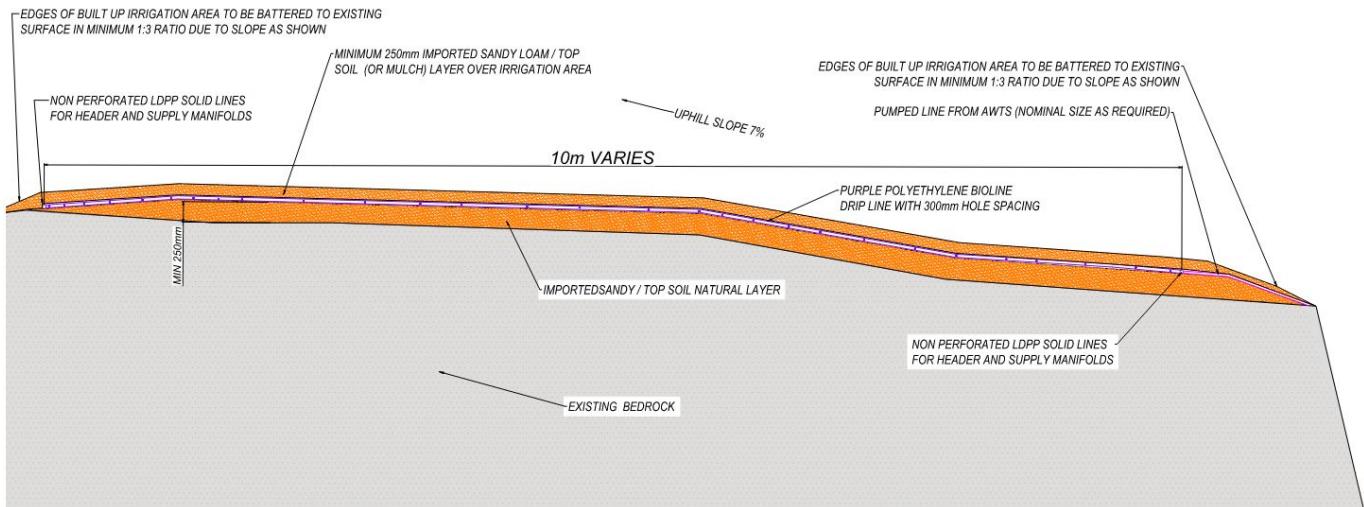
RECOMMENDED IRRIGATION CROSS SECTION DETAIL
